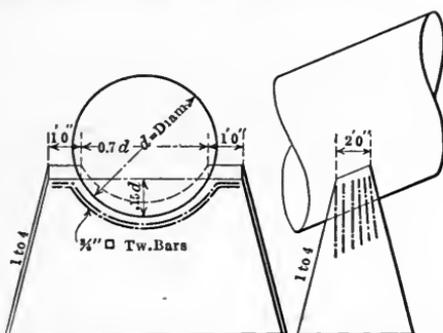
Standard piers for steel pipe. Jawbone Siphon, Los Angeles Aqueduct, Calif.
